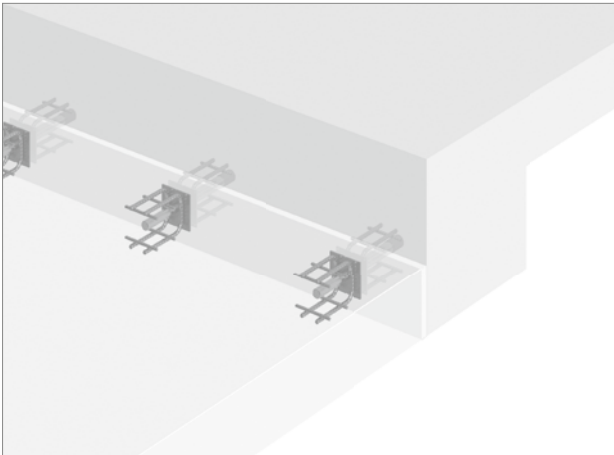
Schöck Stacon® type SLD: slab-downstand beam connection
